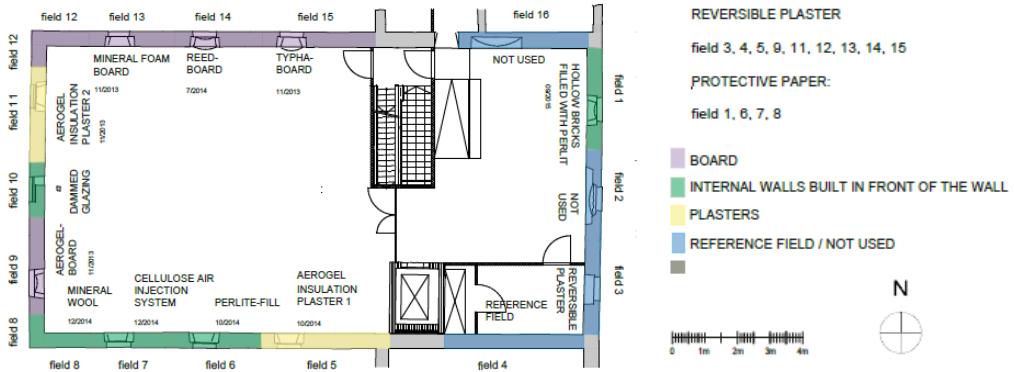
Floor plan of the upper floor of the "Alte Schäfflerei" with different insulation systems.
